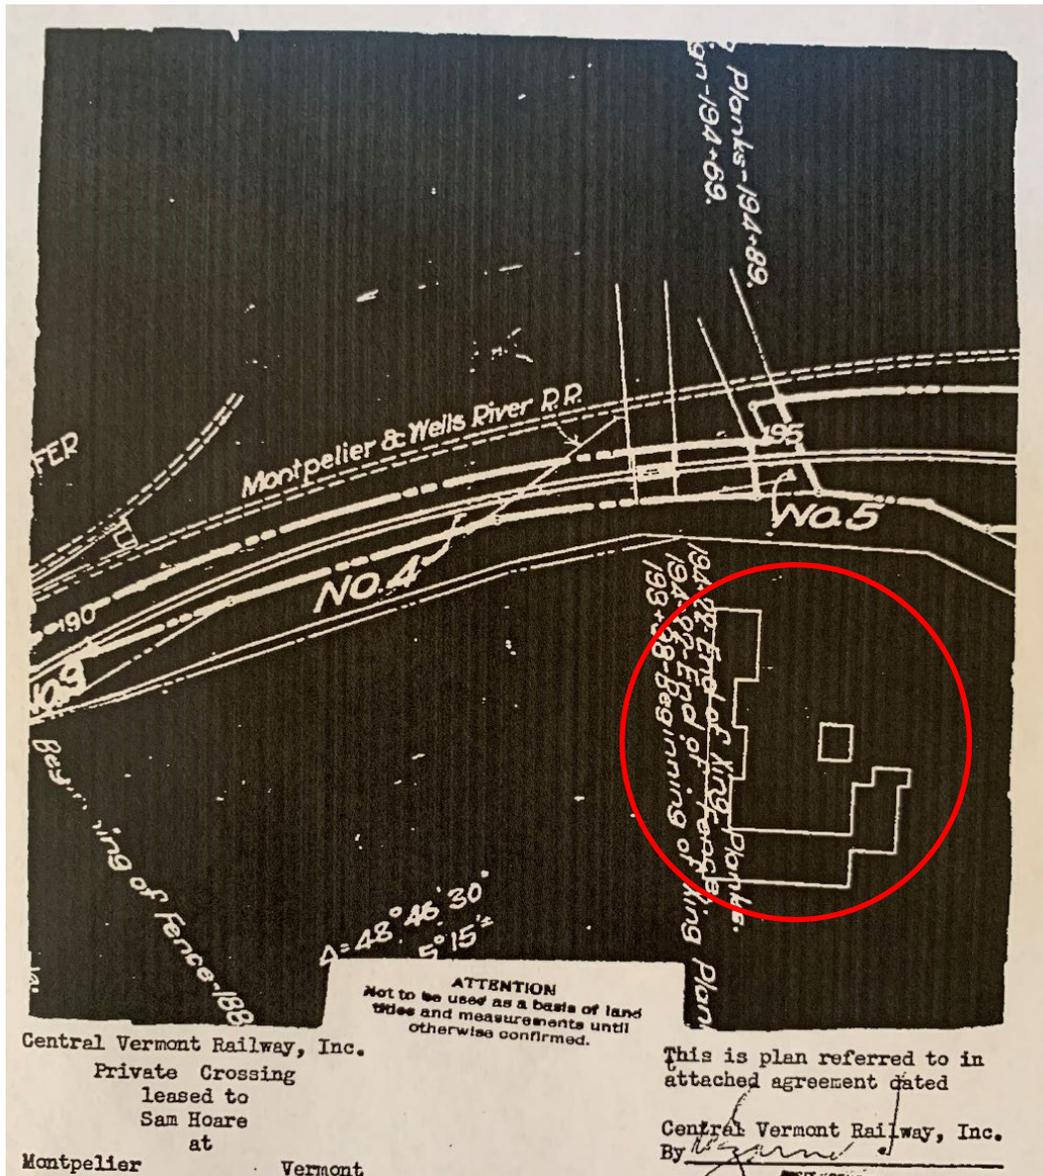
Central Vermont Railway, Inc. Plan of Private Crossing, 1949. Private crossing was terminated in 1997. Plan depicts subject residence with attached agricultural outbuildings, since removed. See historic context for further detail.
